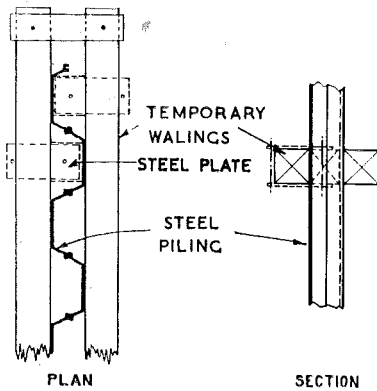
TEMPORARY WALINGS FOR THE ALIGNMENT OF STEEL SHEET PILES DURING DRIVING.
